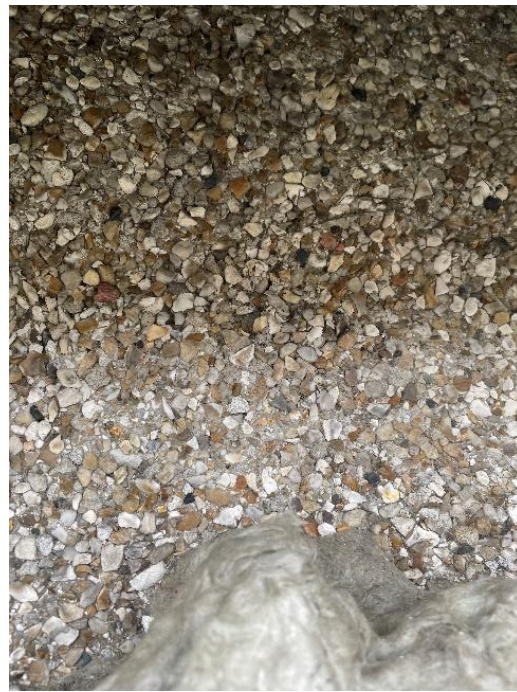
Location 4.4 portion of the original external wall not concealed by insulation
